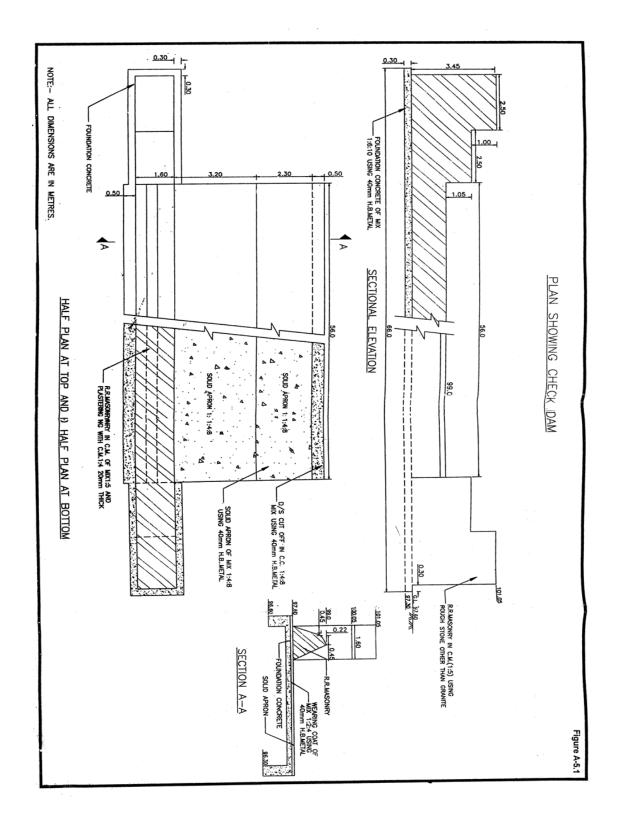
Design Plan for Check Dam; Source: Goulburn Murray Water. (2015).
